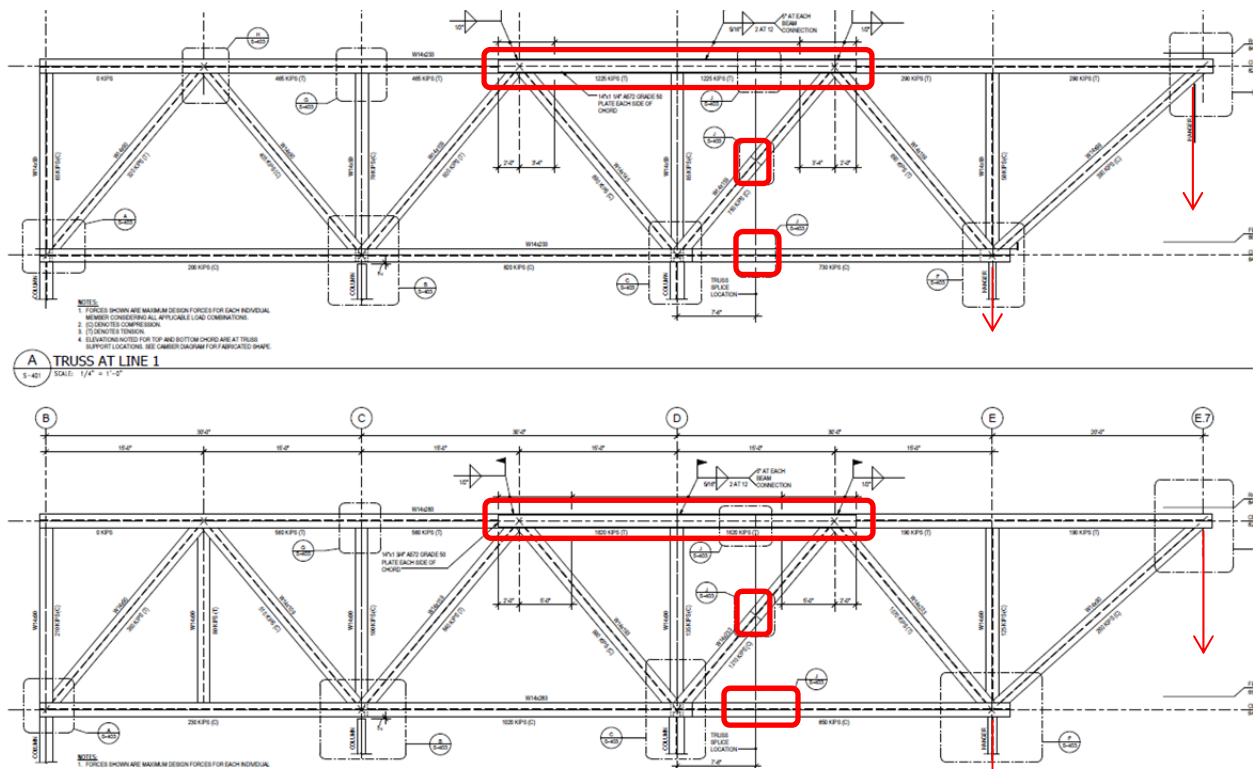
Roof Truss Splices and Loading (From Construction Documents Provided by MBP)
